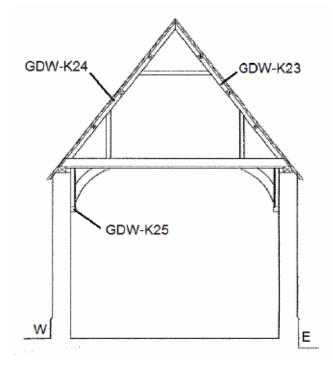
Truss 9, showing the location of samples GDW-K23-5 (Wood and Stephen Design Management)
